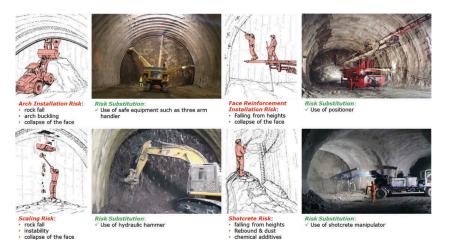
Example of risk reduction trough the application of a full-face excavation method.
